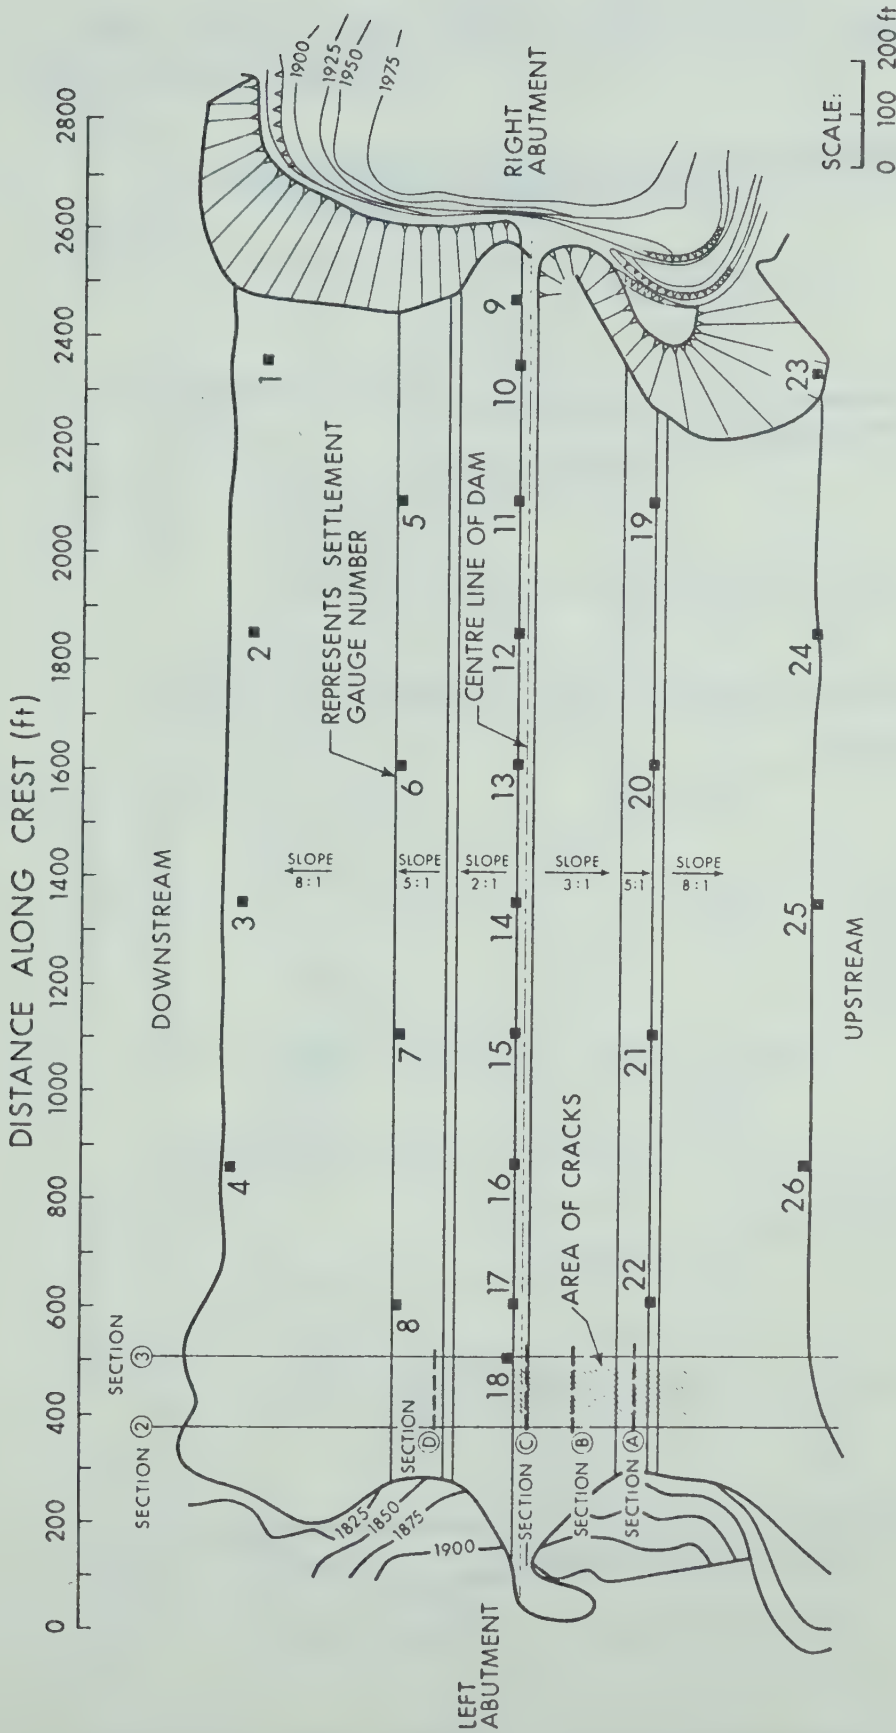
PLAN VIEW OF DUNCAN DAM SHOWING LOCATION OF SETTLEMENT GAUGES AND AREA OF CRACKS
